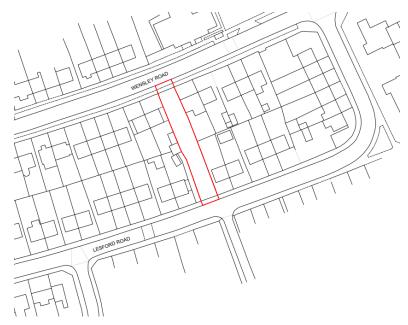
Extract of Site Location Plan HTA-A-DR-001
